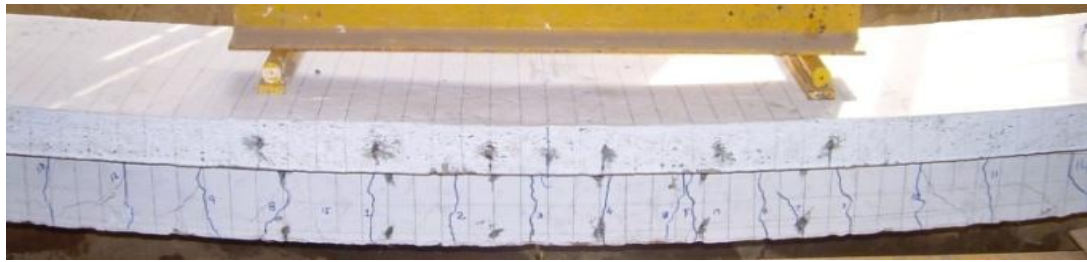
Flexure Test of Flanged Beams under Static Loading Condition
